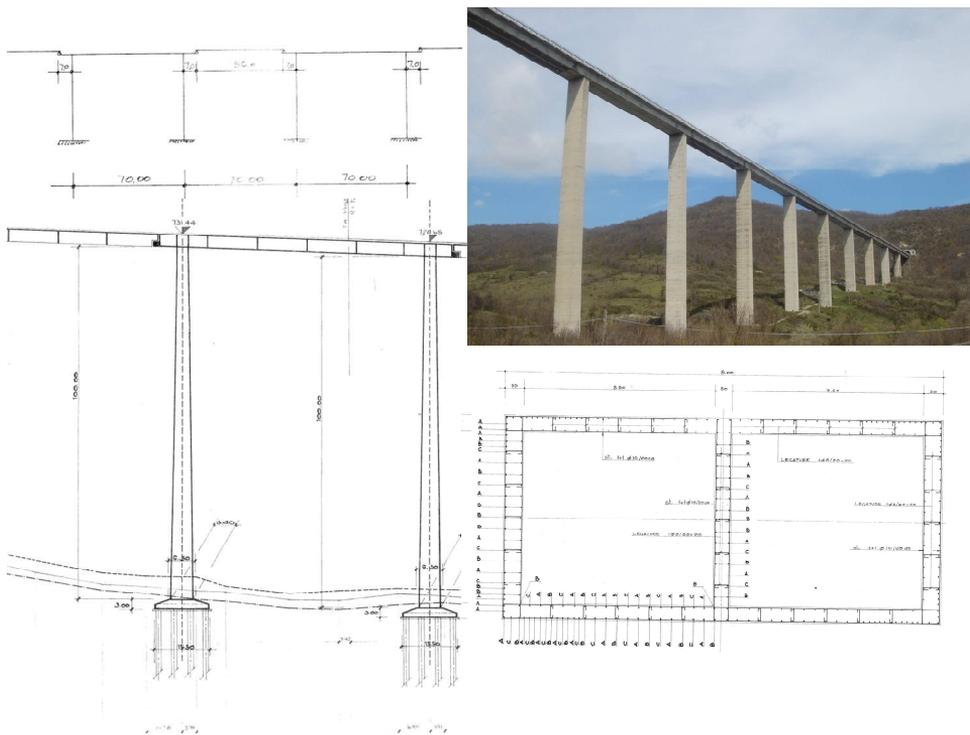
On frame viaduct with rectangular hollow bi-cellular piers, and vary types on foundations
